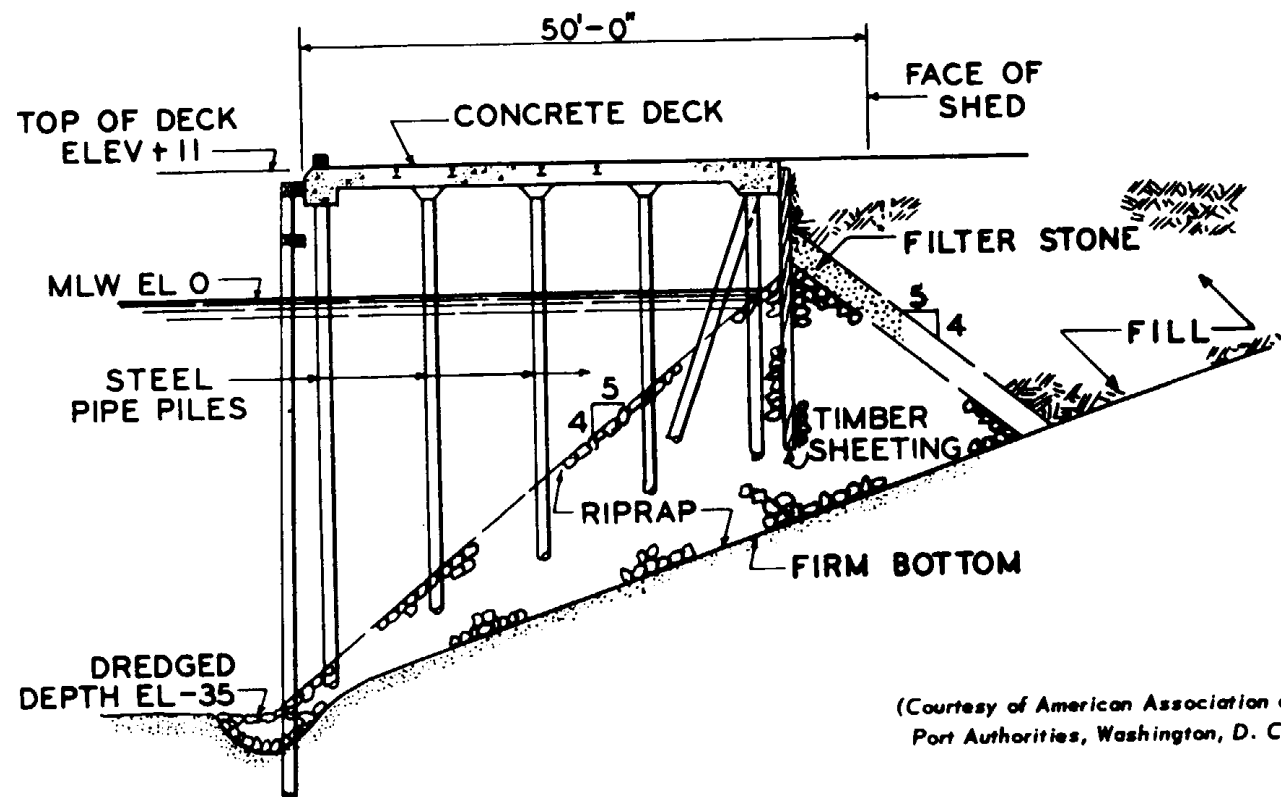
High-Level Open-Type Wharf Construction with Concrete Flat Slab Deck on Steel Pipe Piles.
